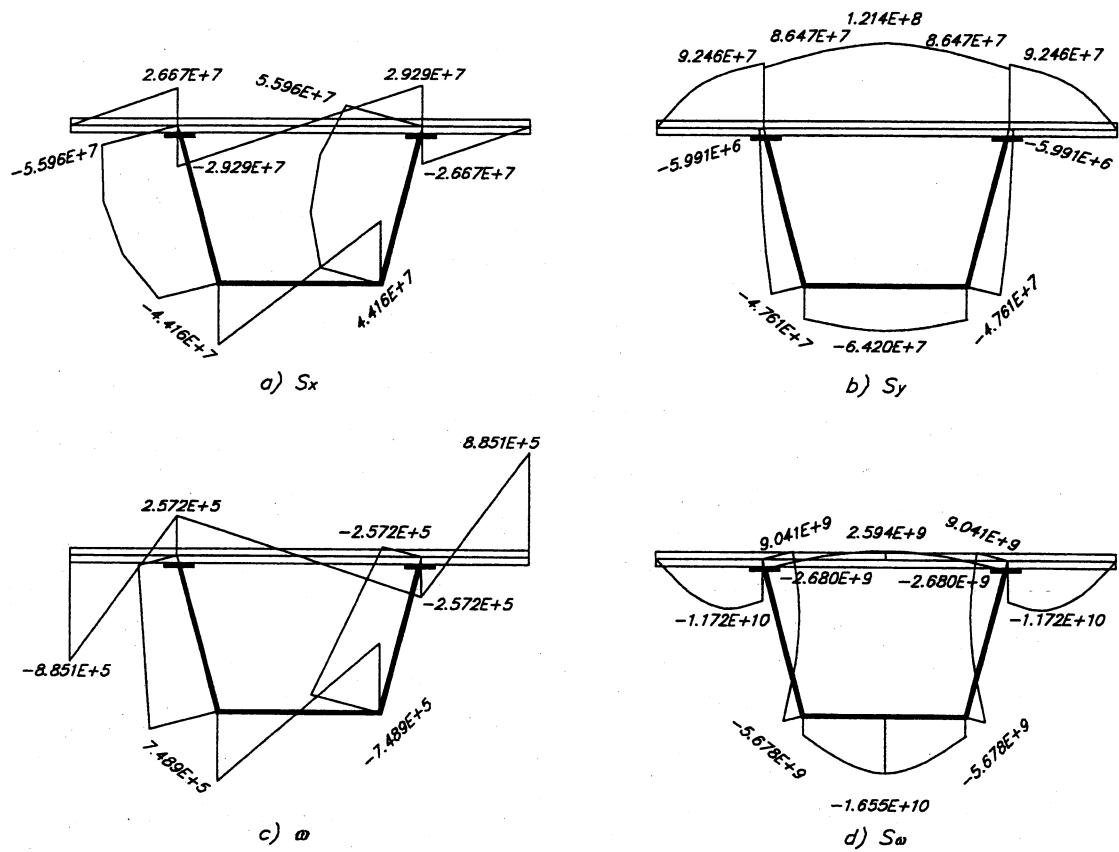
Geometric properties for Bridge 538 (closed cross-section with concrete deck)
